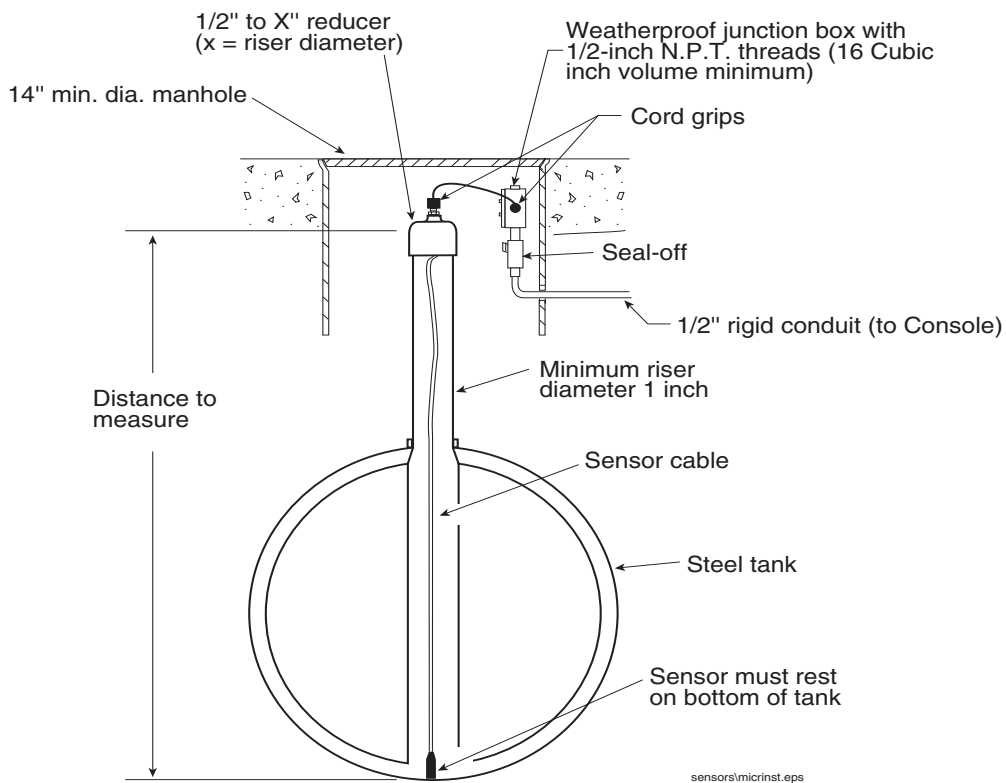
Sensor Dimensions and Installation - Steel Tanks
